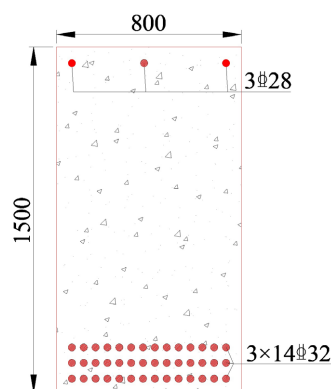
Reinforcement diagram for doubly reinforced cross-section of simply supported beam
